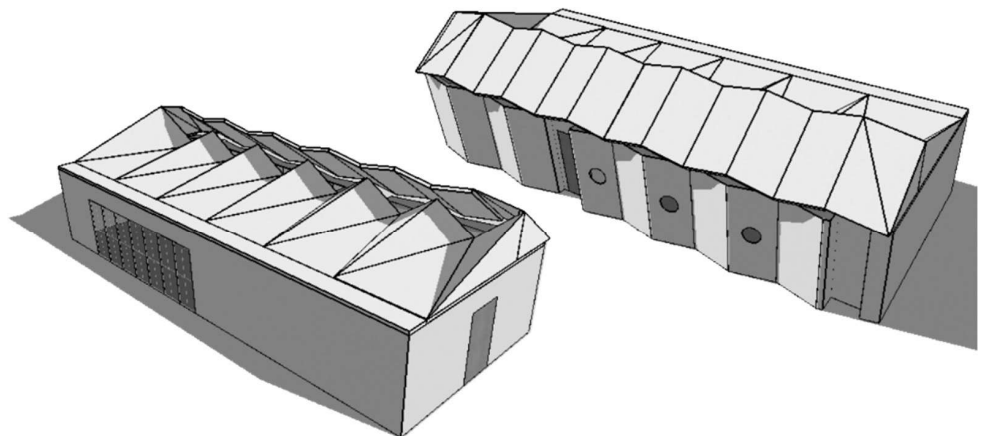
Cardboard Classroom (Authors via DesignBuilder). Image 7.4.1—Cardboard Classroom floorplan (Authors via DesignBuilder).
